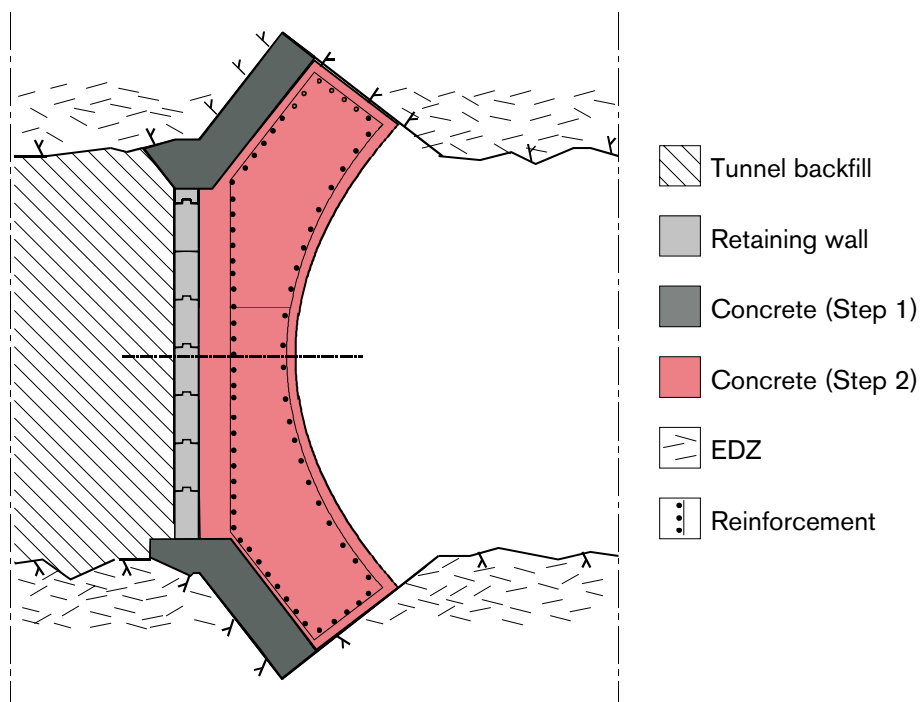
The design of the deposition tunnel plug, schematic drawing.
